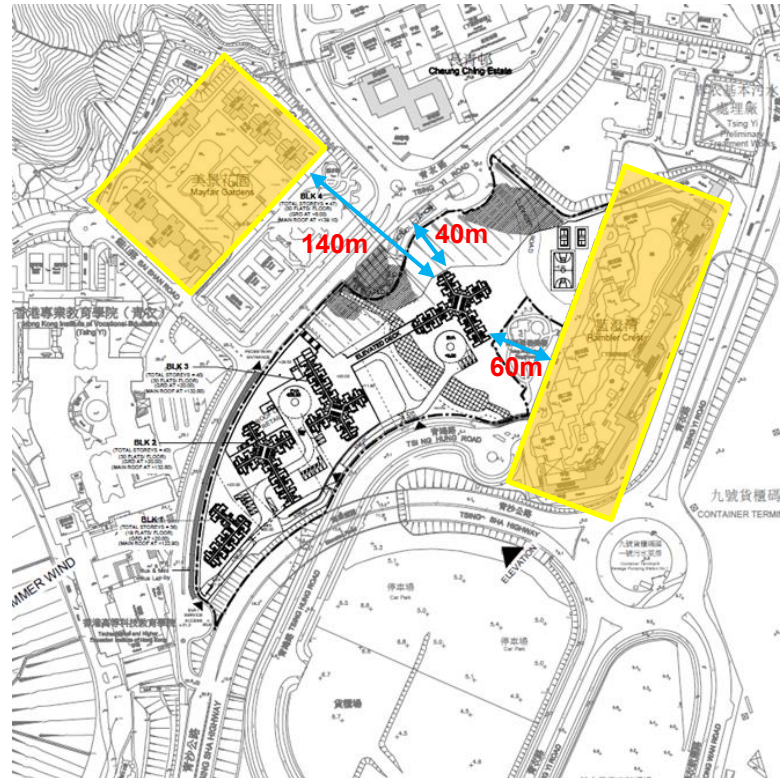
Building Separation under Existing, Baseline and Proposed Scenarios
